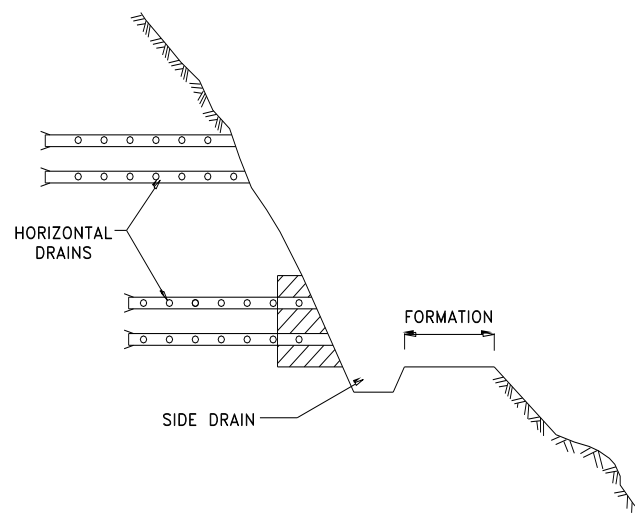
SLOTTED HORIZONTAL DRAIN
